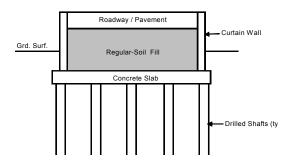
Fill over Slab-on-Piles (FSOP) Design Concept.
